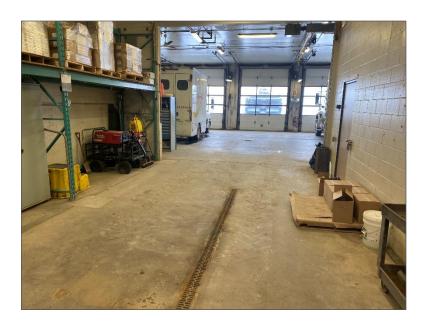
Floor trench located within the southwest portion of the Site Building.
